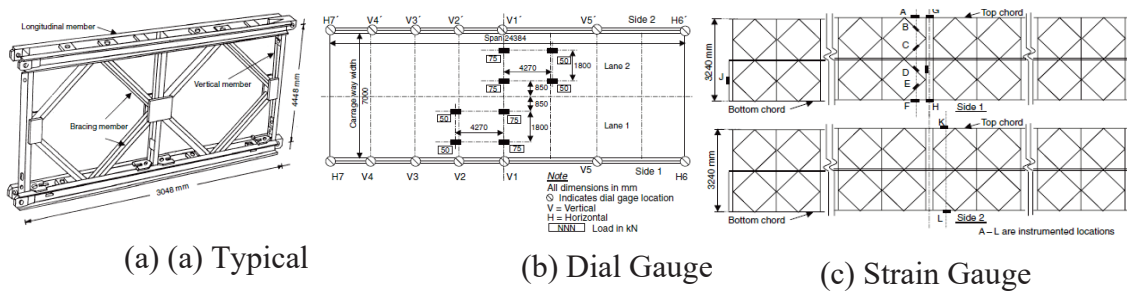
Instrumentation of Bailey Bridge (Parivallal et al, 2005)
